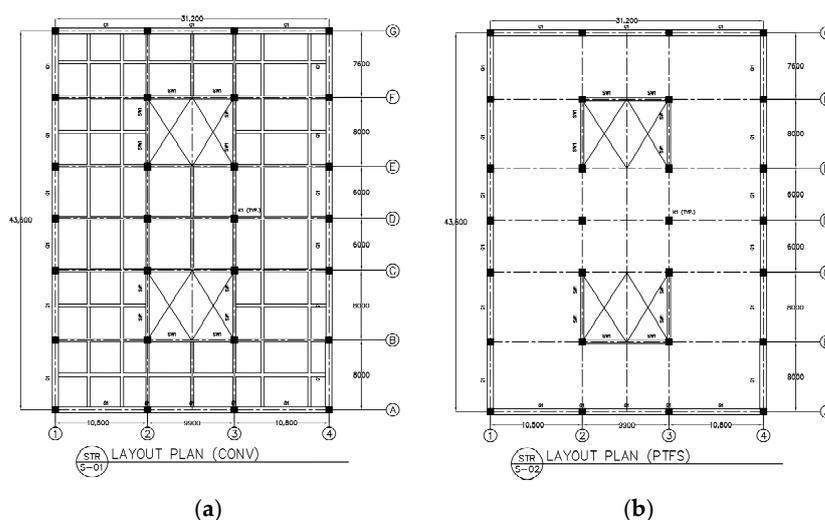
Floor plan: (a) Conventional structure and (b) PTFS structure.
